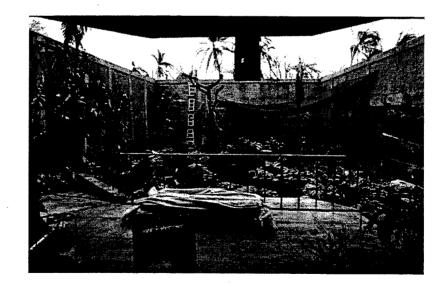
Tilting of Aluminum Frame Greenhouse in Hurricane Andrew's Aftermath. (Photograph courtesy Fairchild Tropical Garden.)
